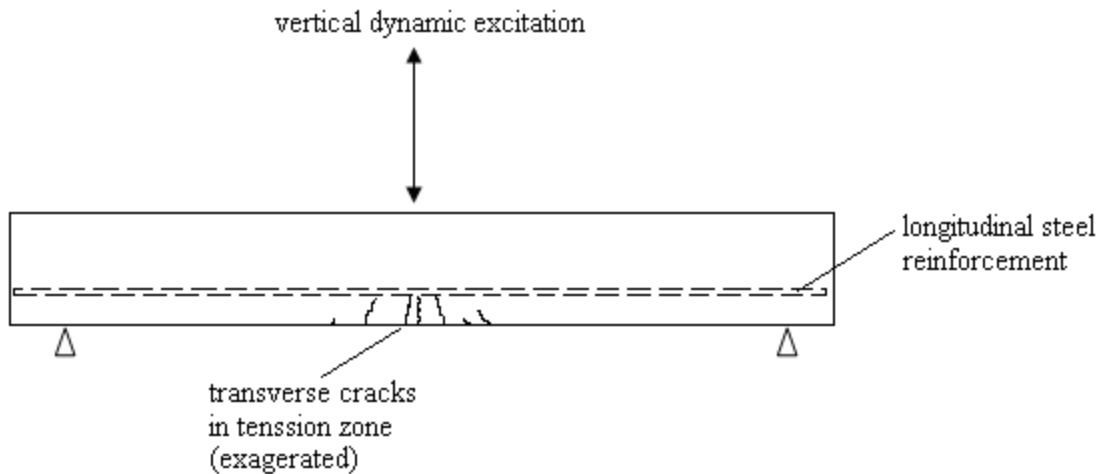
Vibration tests were carried out on the beams after inducing transverse cracks using static loads.
